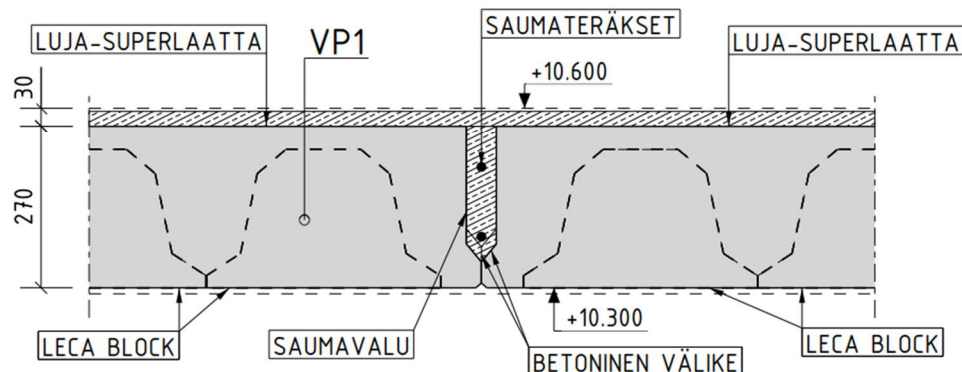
Longitudinal joint (Tekla Structures drawing snapshot)
